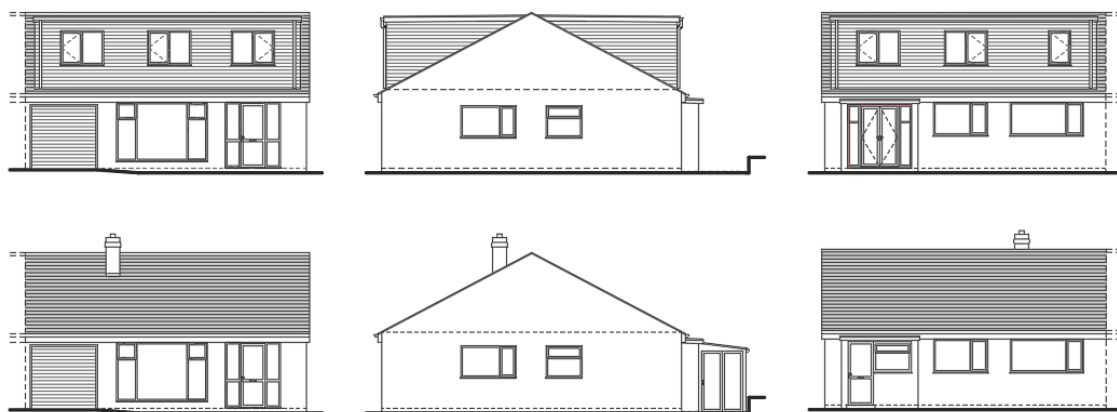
EXISTING AND PROPOSED ELEVATIONS
